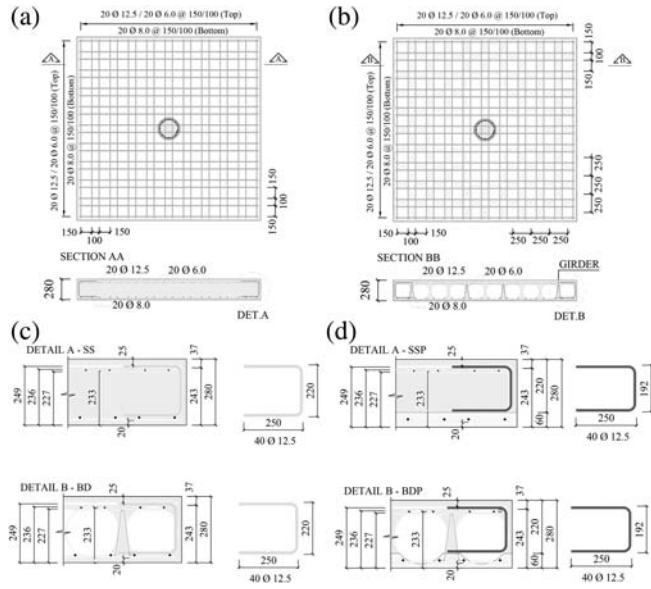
Reinforcements: (a) SS slab, (b) BD slab, (c) details in SS and BD slabs, (d) details in the SSP and BDP slabs (dimensions in mm). BD, *BubbleDeck* slab; SS, solid slab
